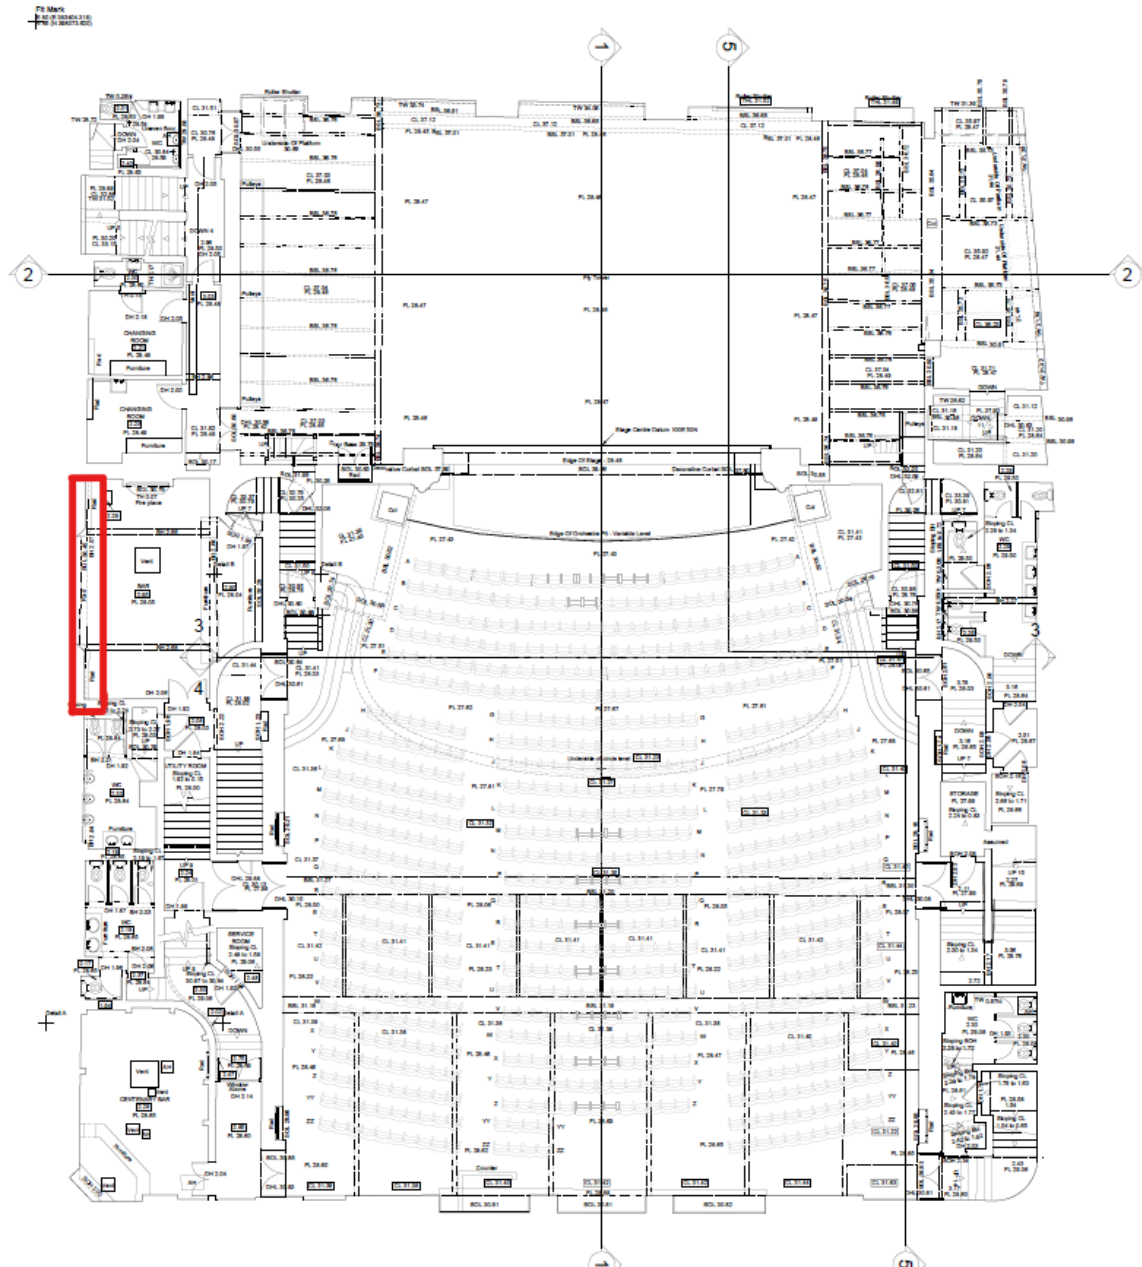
Plan at stalls level showing location of lightwell within Stalls bar.
